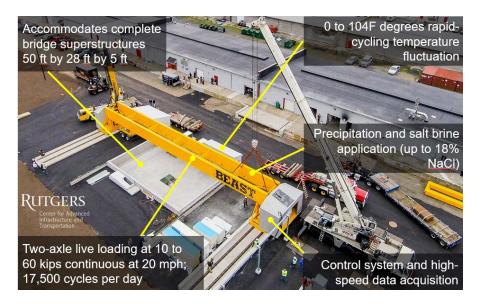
Bridge Evaluation and Accelerated Structural Testing (BEAST) Laboratory
